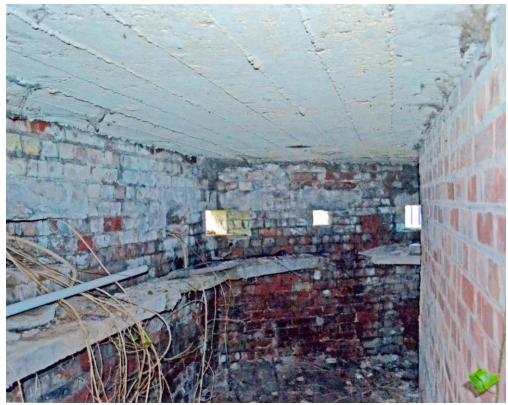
Interior Sturrock's Farm Pillbox, showing concrete slab roof and concrete firing shelves for resting rifles.
